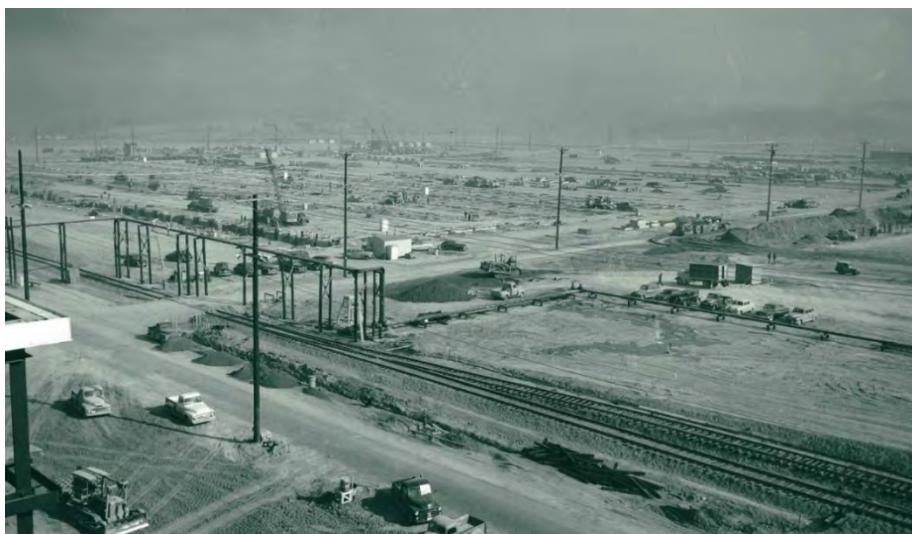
Construction of X-333 Process Building Foundations Looking Northeast (1953)
